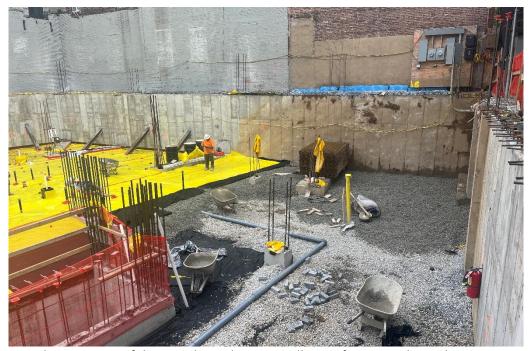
View of the SSDS layer during installation, facing south-southwest.
